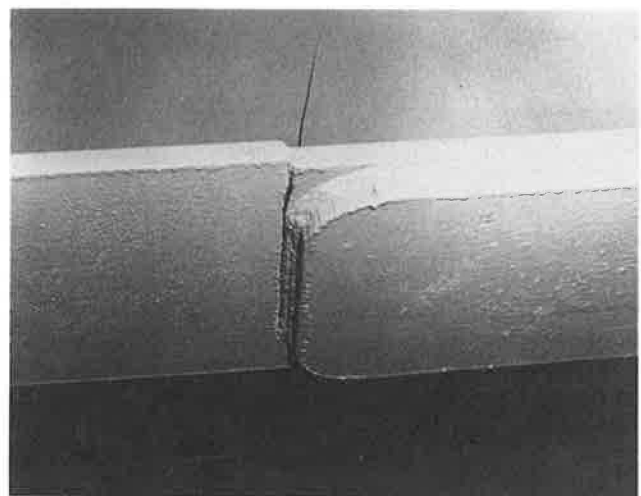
Fatigue crack at end of coverplate on Yellow Mill Pond bridge.
